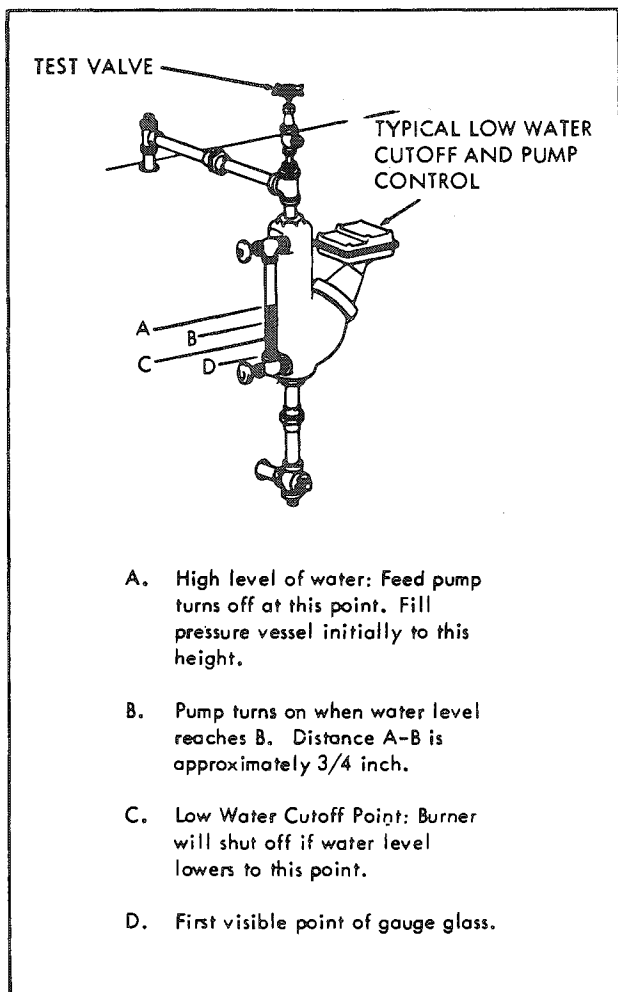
BOILER WATER LEVEL DETAILS (STEAM BOILER)
